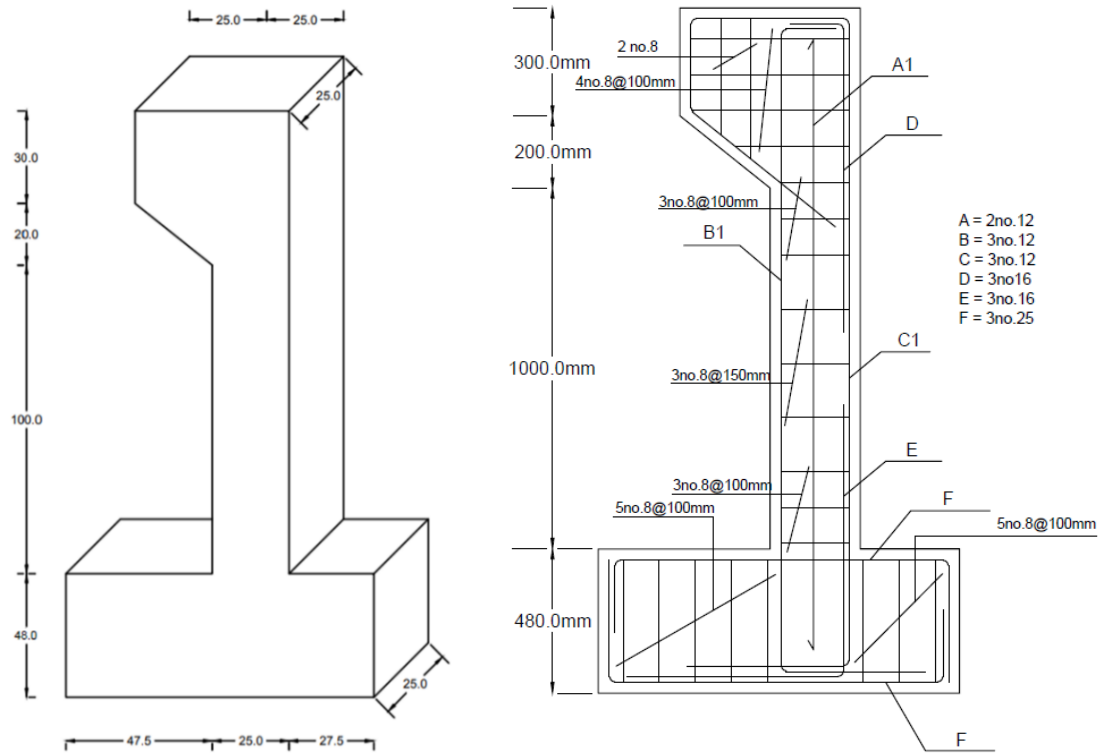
General view and cross section of the (1.5m) RC Column specimen
